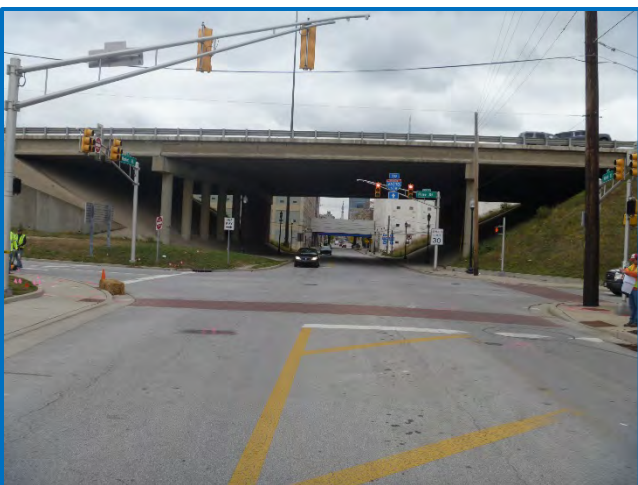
View of the I-65 bridge over Market Street facing west (10/30/2015).
